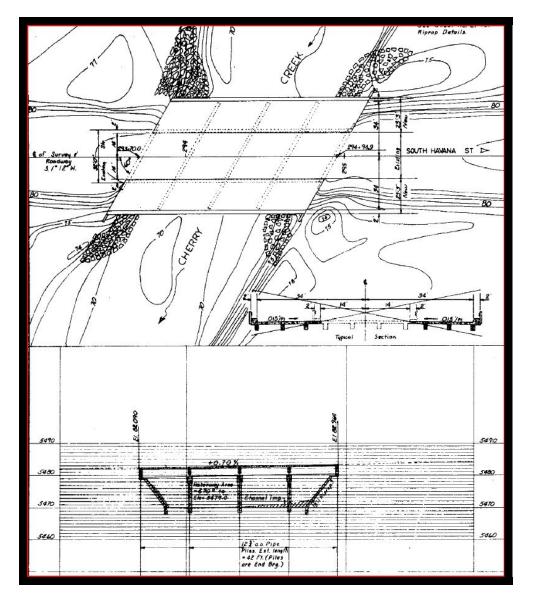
Existing Bridge Structure – CDOT As Built Drawings
